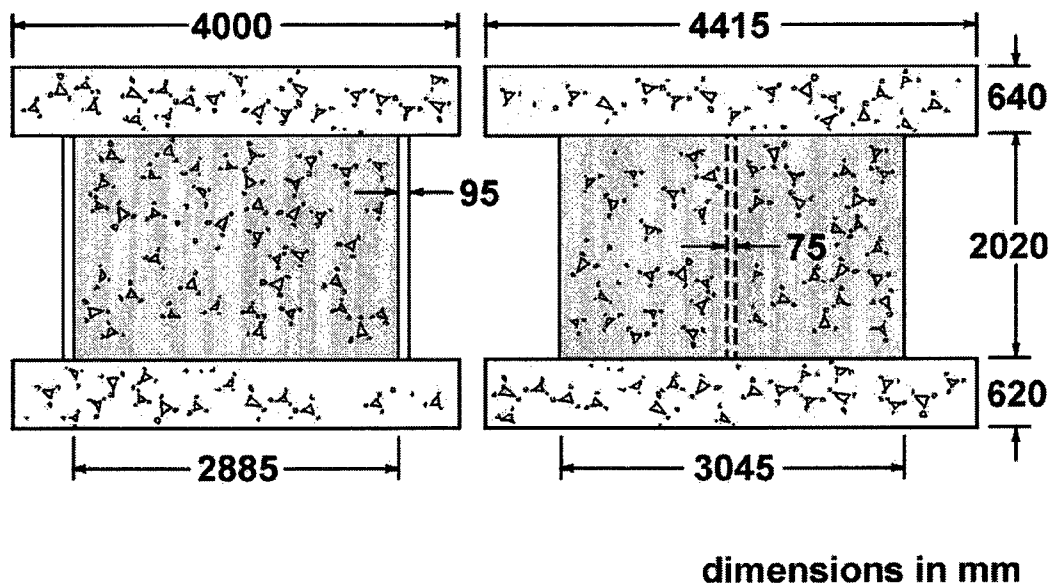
DP Walls (Palermo and Vecchio, 2002)
